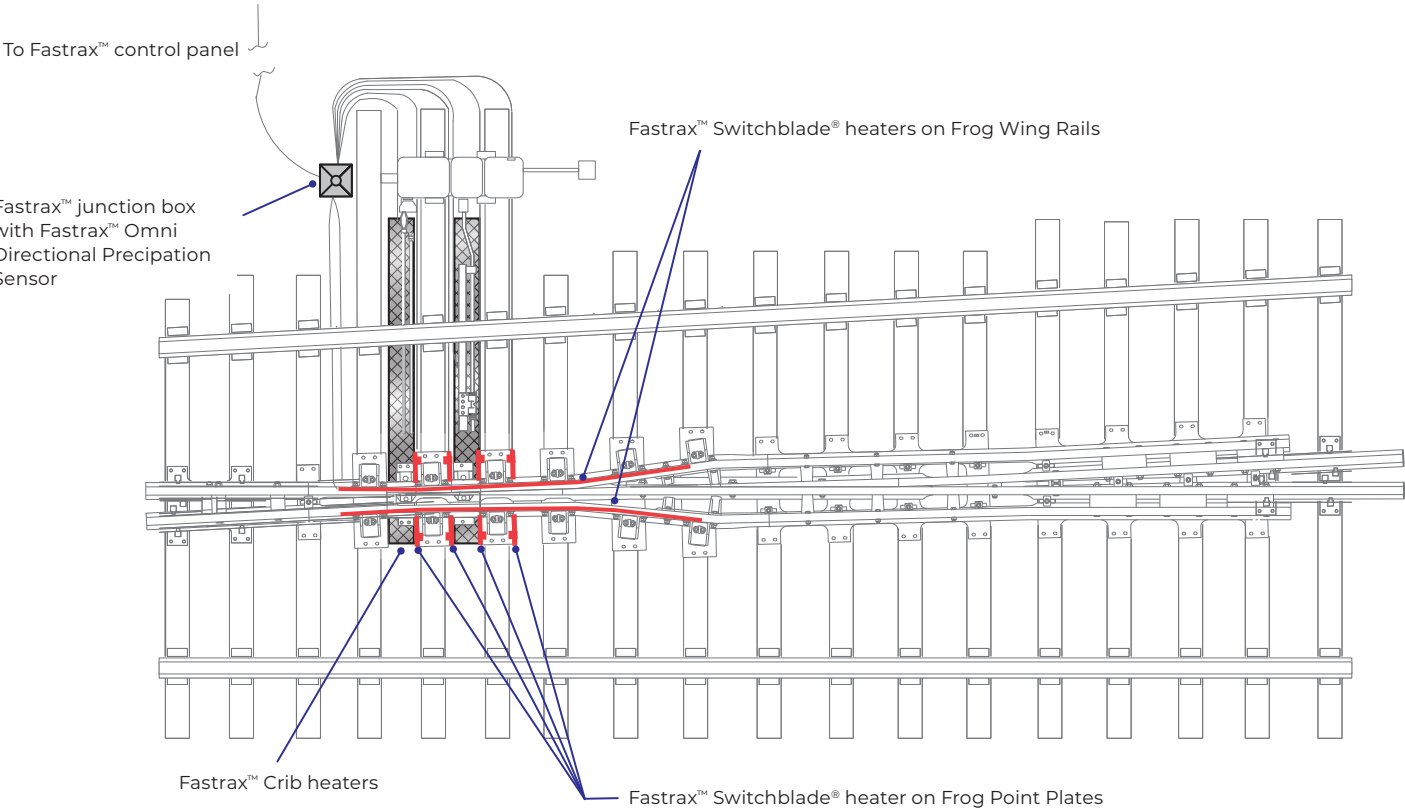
Typical Movable Point Frog Layout - Equipment Detail, No. 20 / 24 Standard Size (All Tie Styles)
